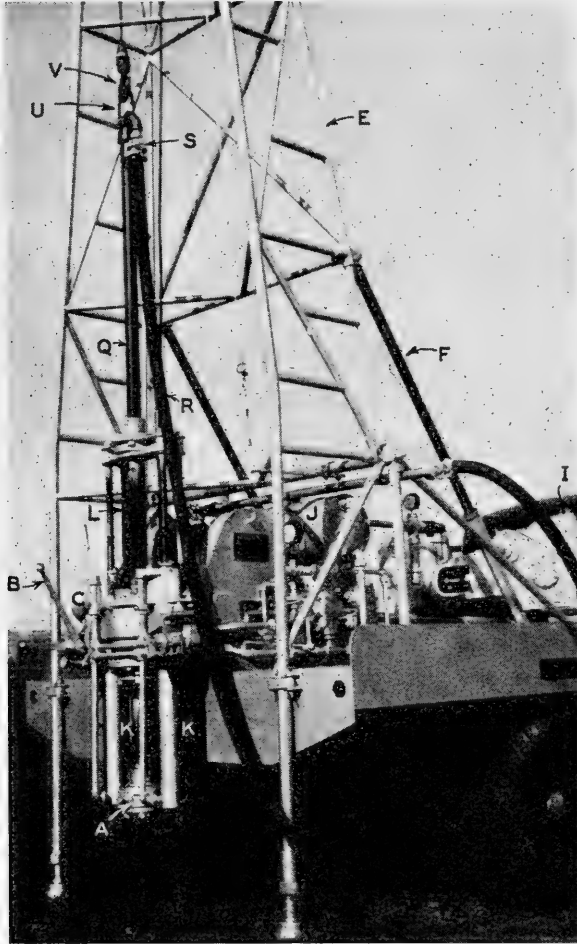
Hydraulic feed type drill, (A) drill chuck; (B) operating controls; (C) cat head; (E) mast; (F) hydraulic mast raising cylinders; (I) mud pump; (J) hydraulic oil tank; (K) hydraulic feed cylinder; (L) drive rod; (Q) drill pipe; (R) swivel hose; (S) water swivel; (U) hoisting bail; (V) safety hook. (Courtesy of Joy Manufacturing Company.)
